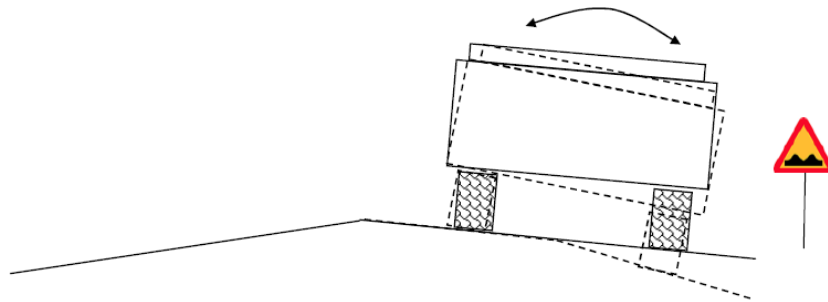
Pavement edge deformations (Granlund, 2008)
